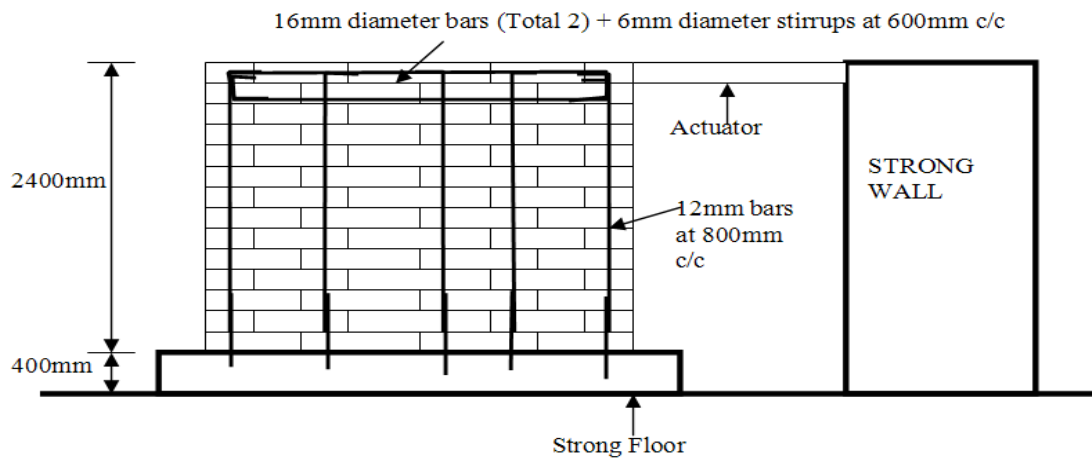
Masonry walls tested in New Zealand (Ingham et al. (2001))
